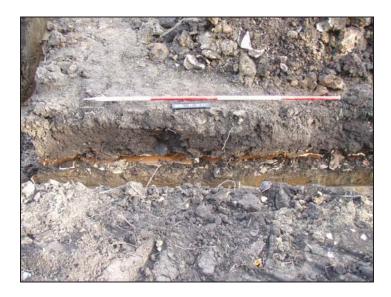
Footing seven showing the broken ceramic drain, looking north (Scale: 2m)
